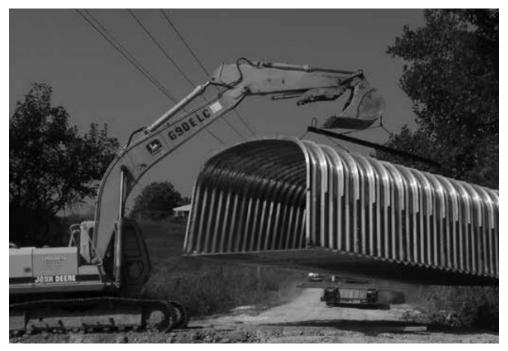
Example aluminum box culvert with invert and a plate and rib combination. Photo: Contech
